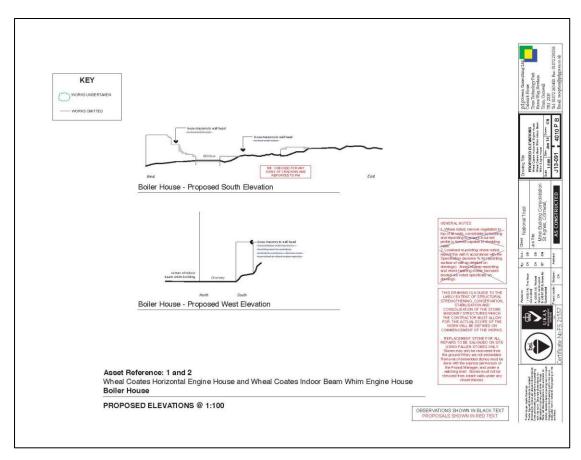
Western and southern external elevations of Wheal Coates whim boiler house.
